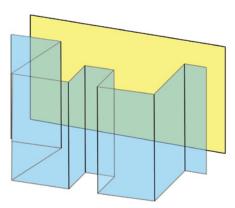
A structural wrap surrounds the existing building to provide added support. This structure is also intended to improve the building facade. (Marta Lilly)
